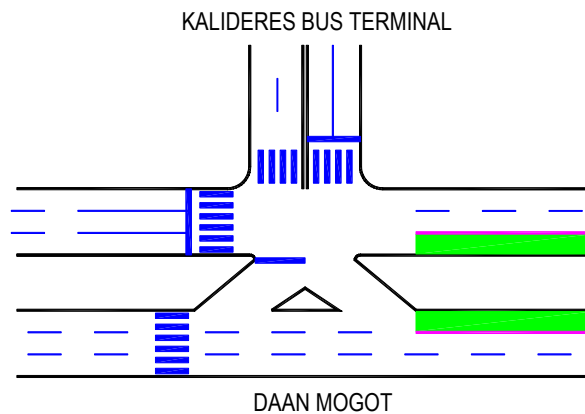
Intersection Layout at Daan Mogot – Kalideres Bus Terminal
